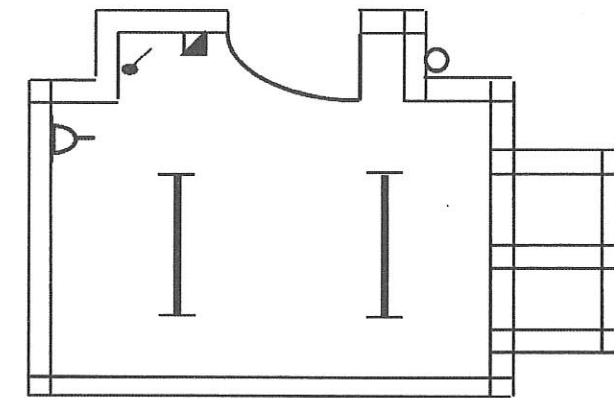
Layout Plan for Electrical Supply System of a mini mart.
